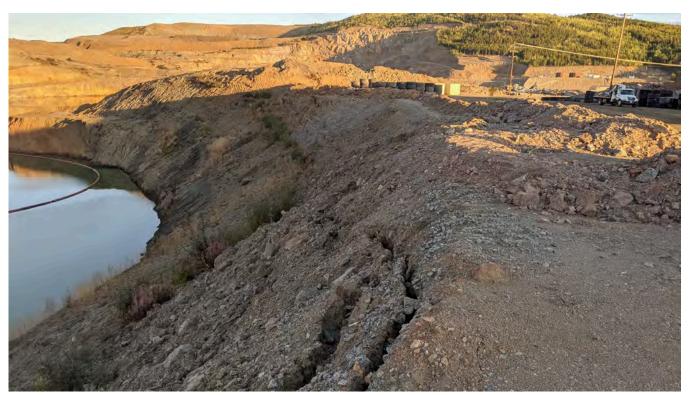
Cracking along the Area 2 Stage 3 Pit rim.
